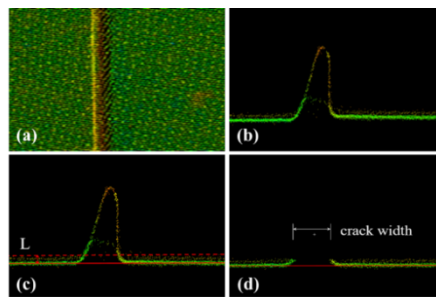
Point cloud removal process inside the crack. (a) Front view of crack point cloud; (b) Side view of the fracture point; (c) Remove points beyond the critical value; (d) Side view after the removal
